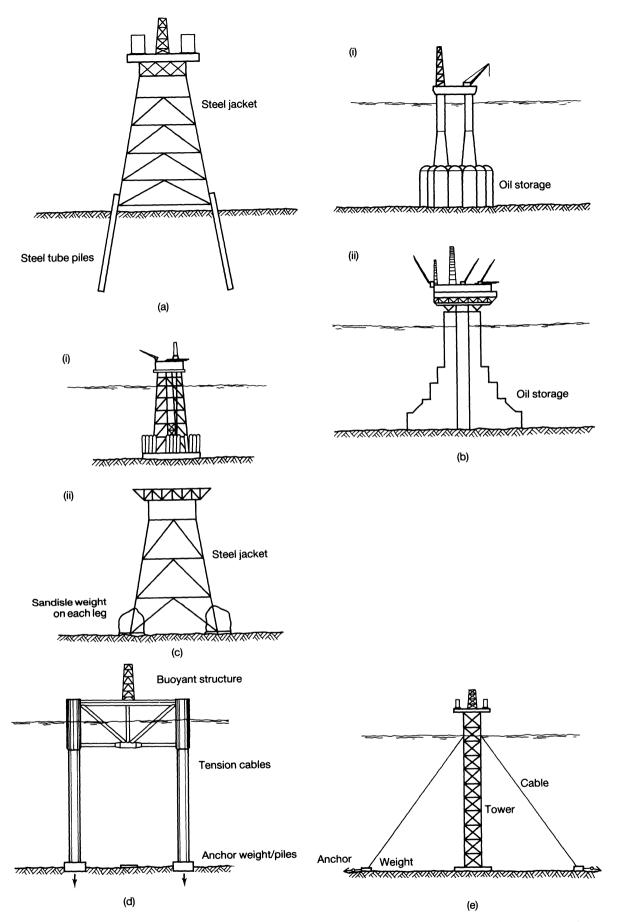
Examples of marine foundation types. (a) Typical piled steel jacket structure. (b) Typical concrete gravity structures: (i) Condeep; (ii) Howard-Doris. (c) Hybrid steel gravity structures: (i) RDL hybrid; (ii) Sandpod. (d) Typical tension leg structure. (e) Guyed tower structure. (After Gibson and Dowse, 1981.)
